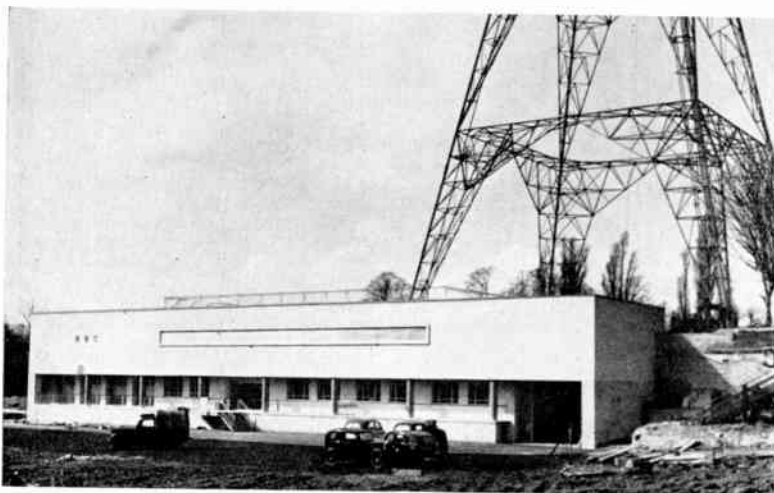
General view of the new London television station at Crystal Palace, taken during construction. The base of the main tower can be seen.
